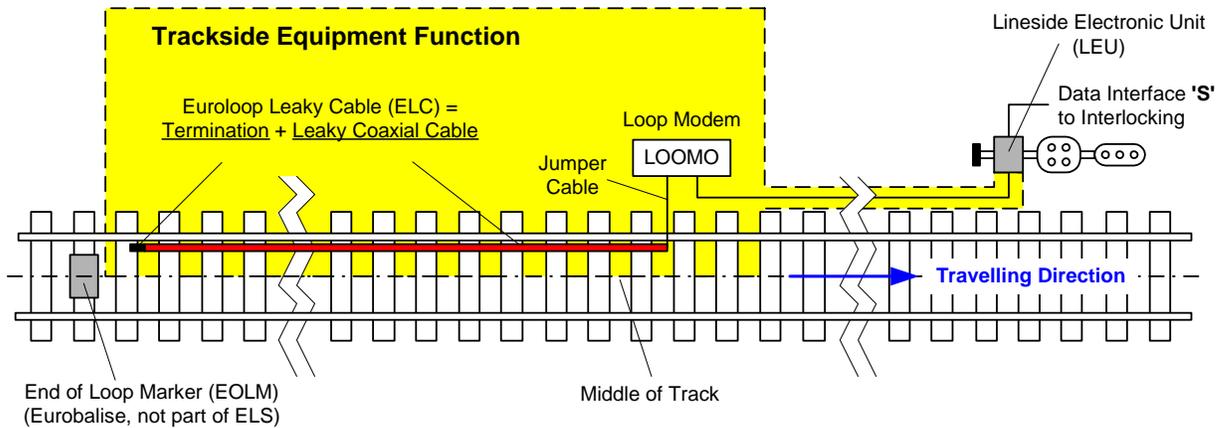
Typical Installation of Euroloop Trackside Equipment
